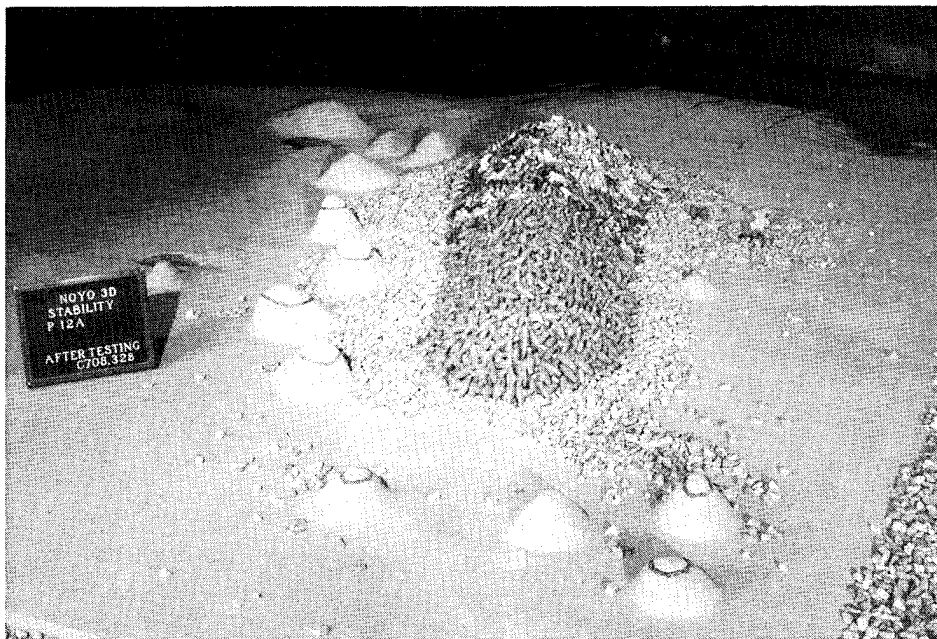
Plan 12, south roundhead after two series of Storm IA waves
